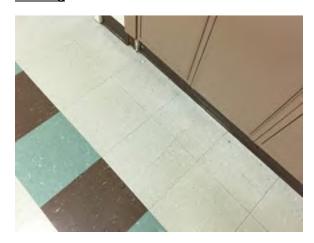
Cafeteria flooring (12x12 VCT) is cracking.
